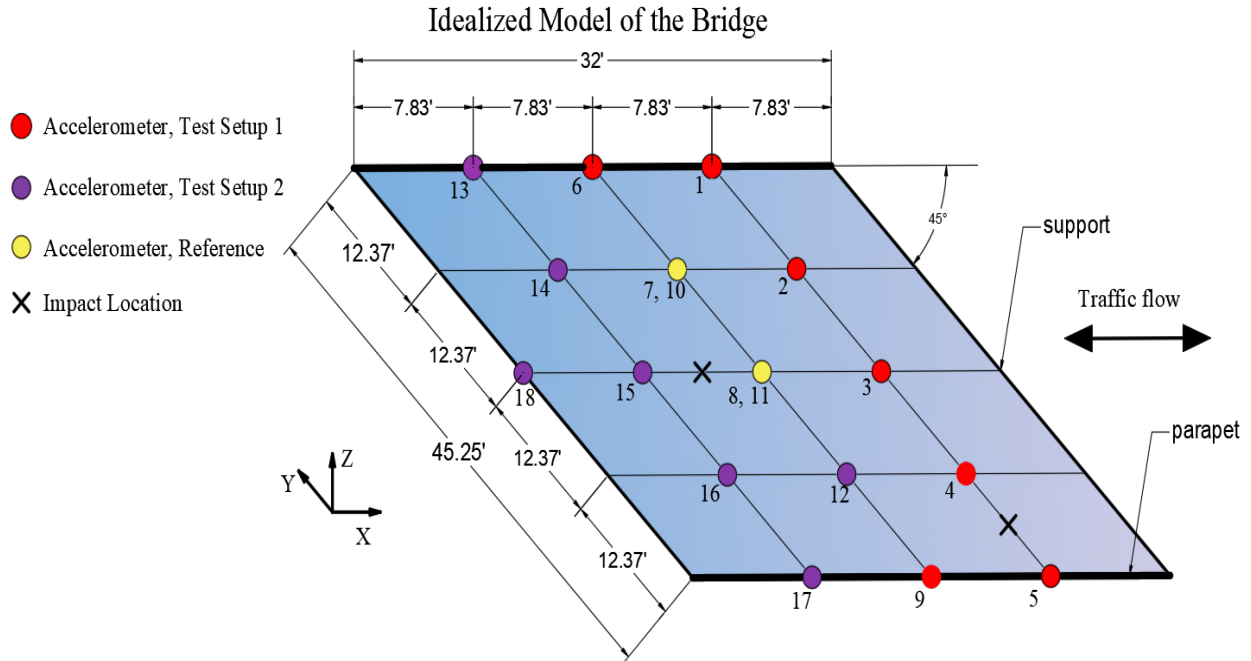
Instrumentation Configuration for War Branch Bridge for Vibration Testing
